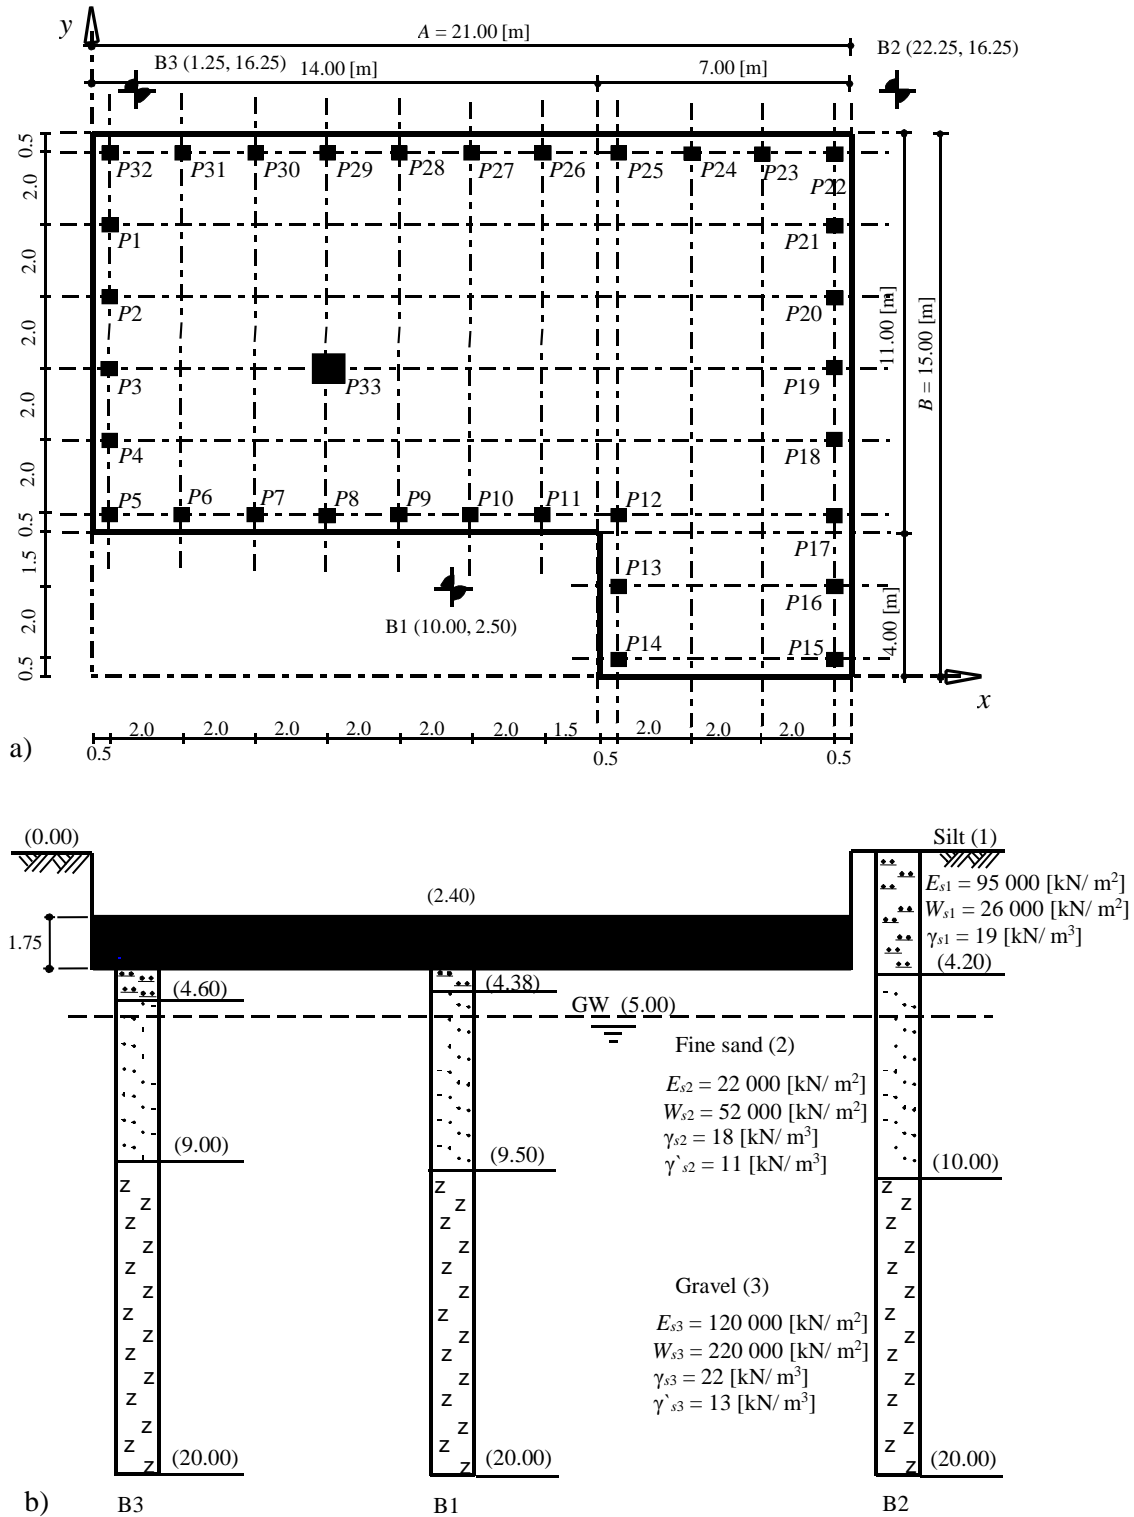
a) Plan of the raft with column loads, dimensions and mesh
